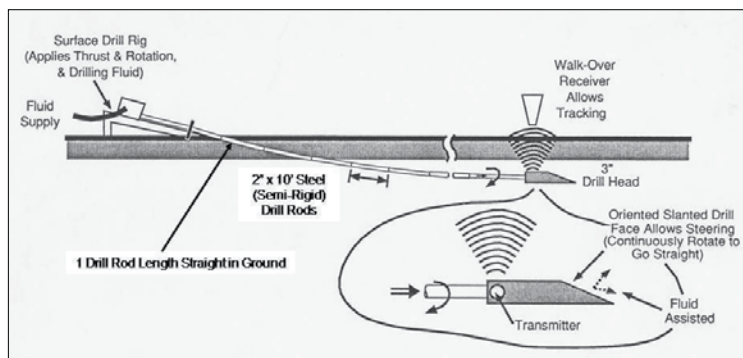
Typical Mini-HDD Equipment and Pilot Boring Process
